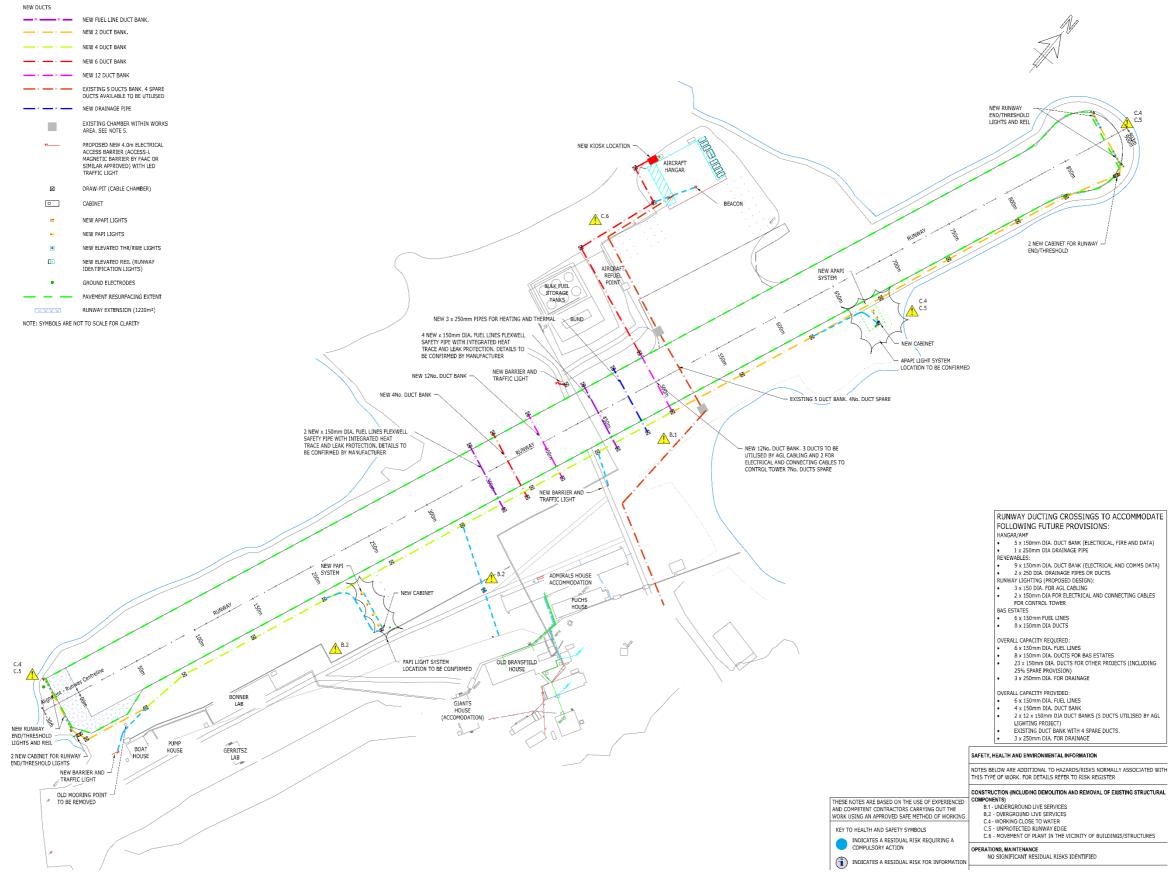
Runway Resurfacing and Lighting proposed arrangement, Ramboll 2022
